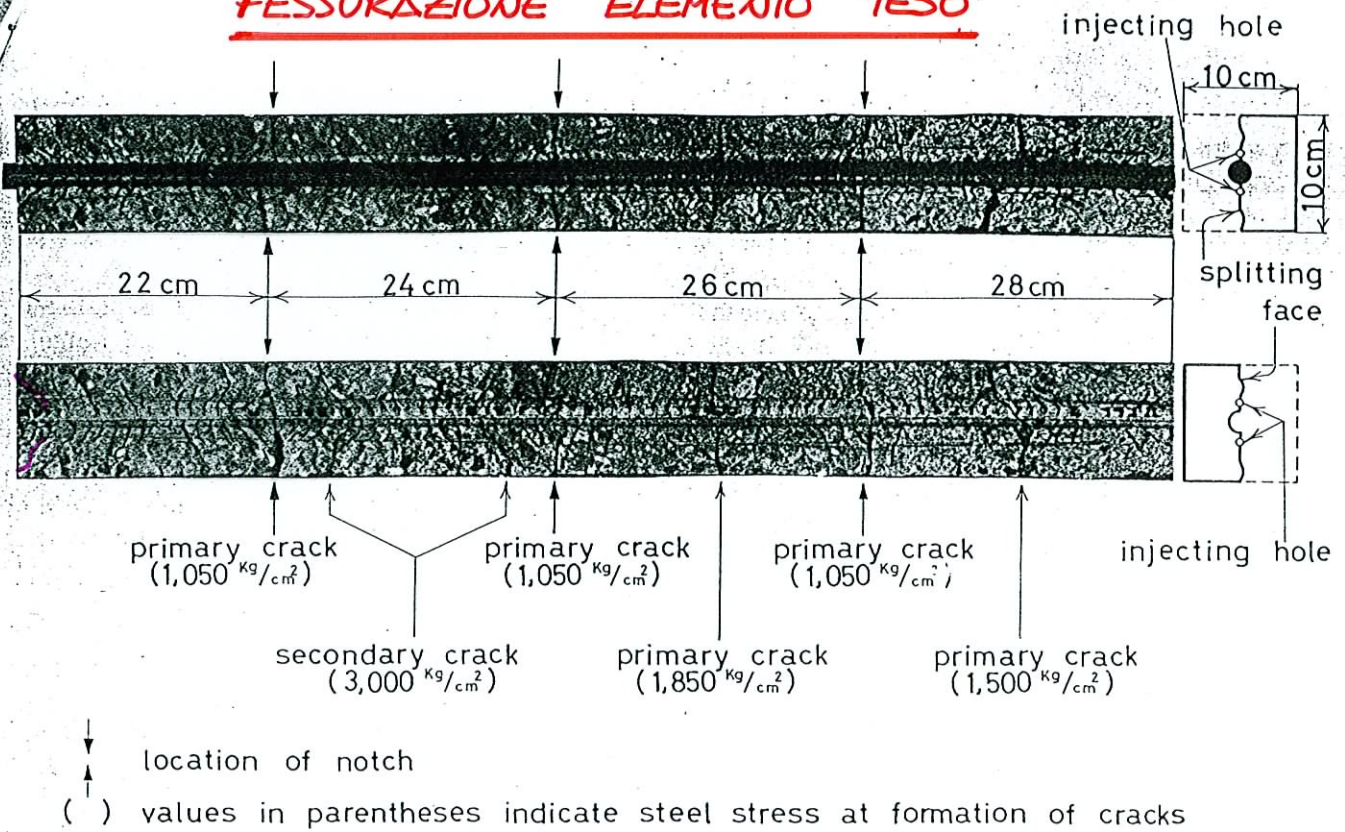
Internal crack and secondary crack with 3/4 in. (19 mm) bar, longitudinal splitting face and cross section
